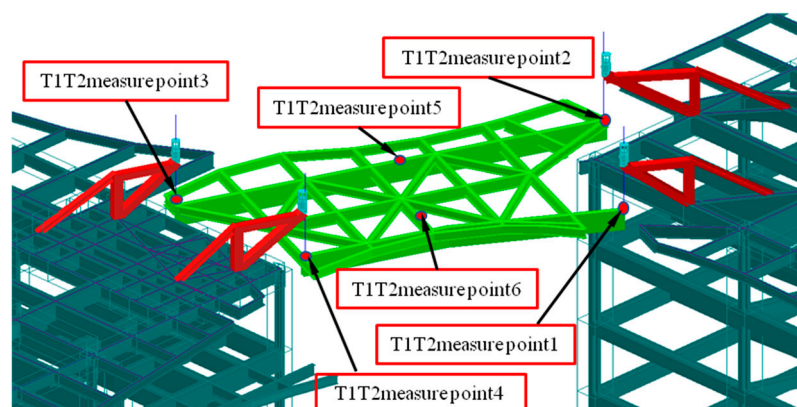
Schematic diagram of measuring point layout of the elevated bridge.
